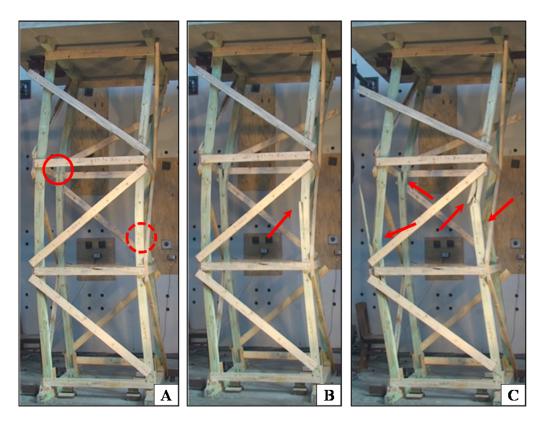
Post Failures A) Initial Failures B) Secondary Failure C) Final State
